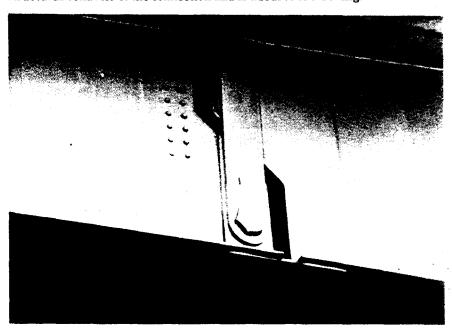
Two-Girder Bridge With a Pin and Hanger Connection
